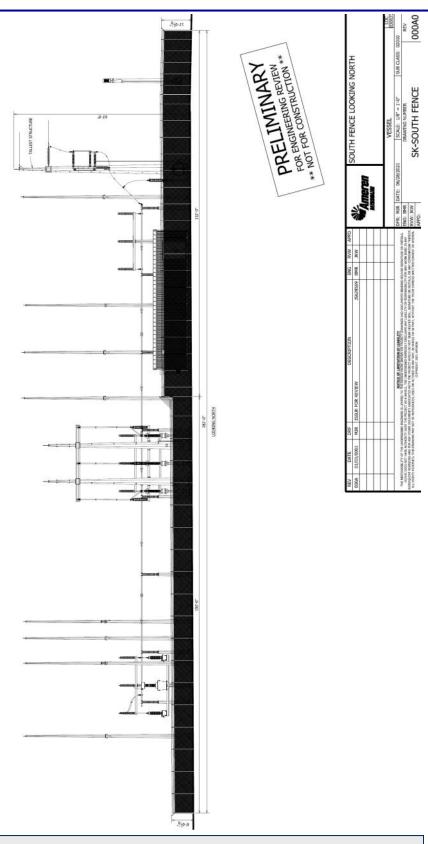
EXHIBIT C: SECTION VIEWS, 3 (SOUTH FENCE LOOKING NORTH)
